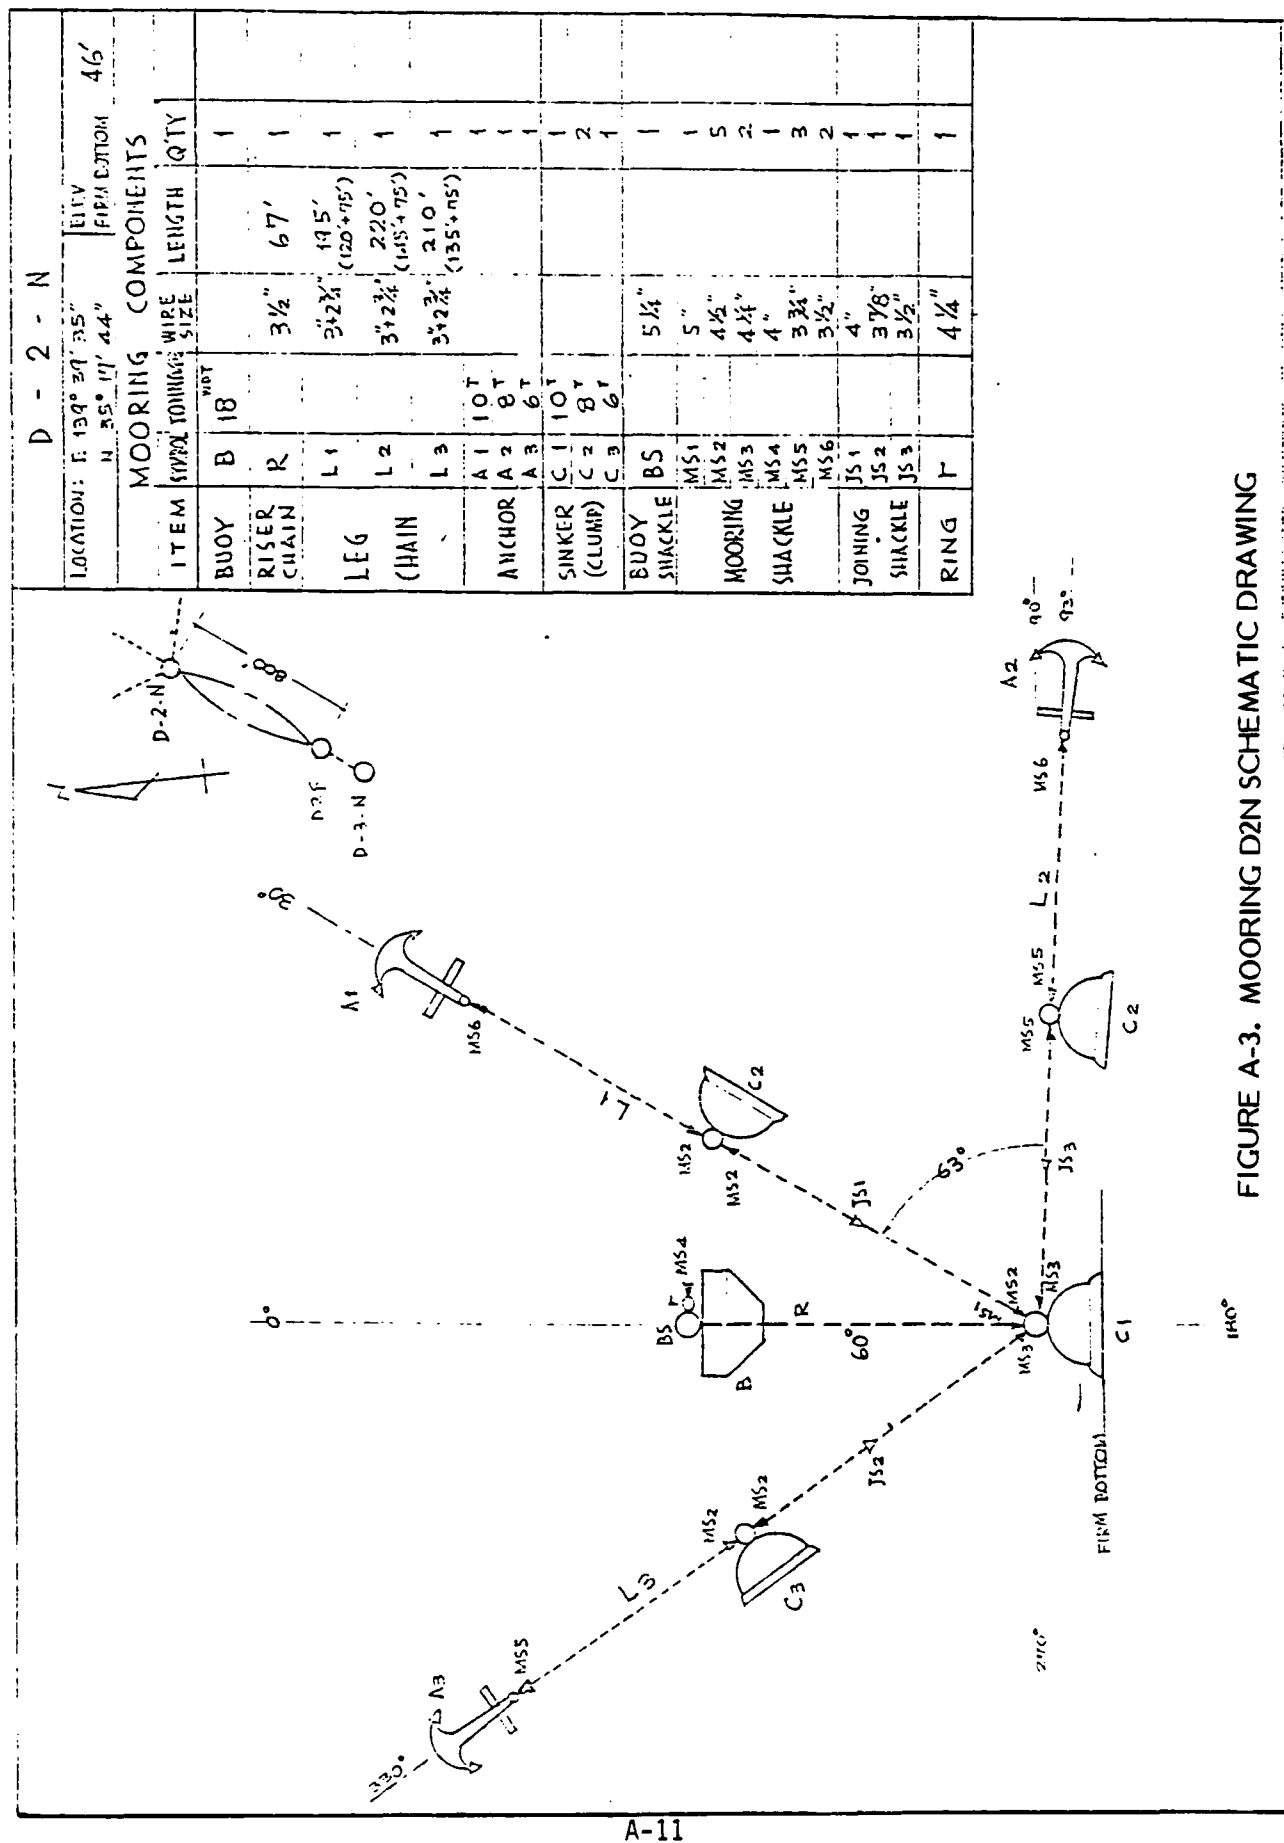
MOORING D2N SCHEMATIC DRAWING
